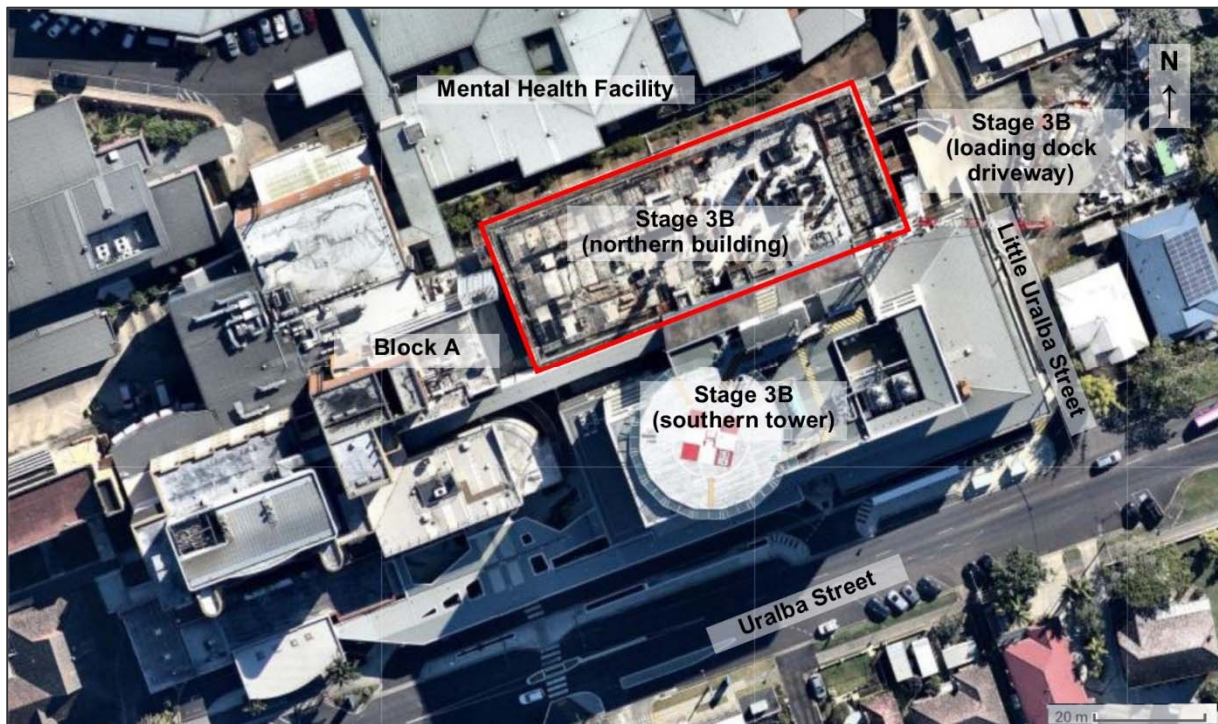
| Existing site layout (subject site in red) (Base source: nearmap)
